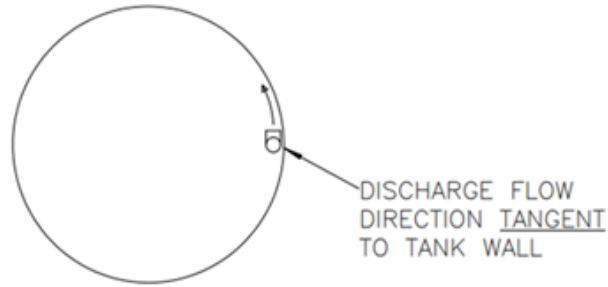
Plan view of NEO suction and discharge layout in a flooded suction installation.
